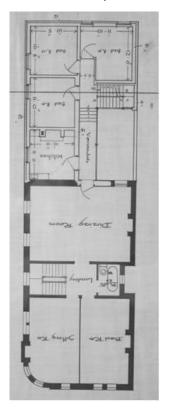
143–143a George Street, alterations undertaken in 1913, First Floor Plan.
